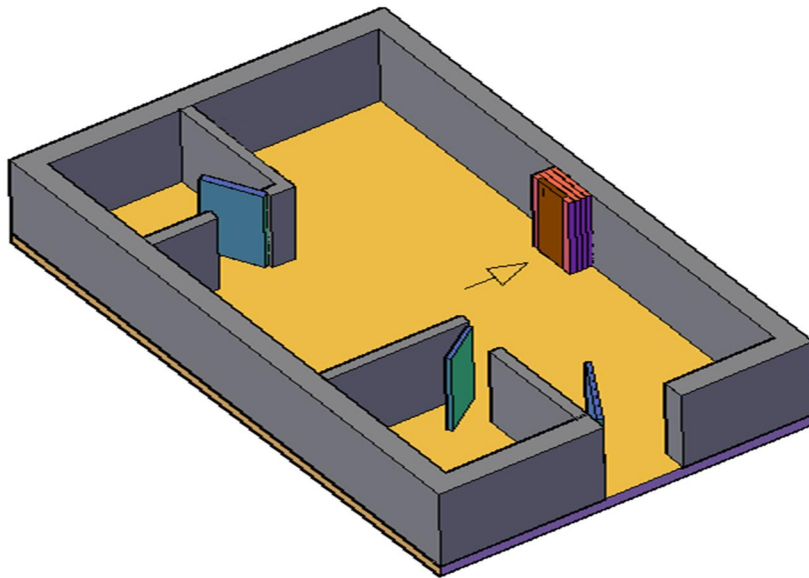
3-D sectional view of Existed one bed room unit design
